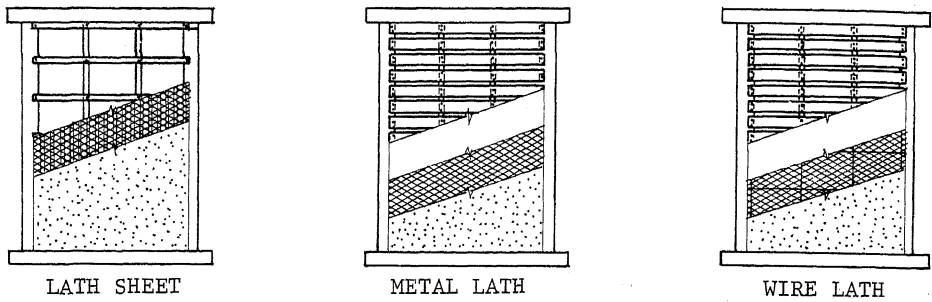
(a) SPECIMENS OF LATH MORTAR WALLS
